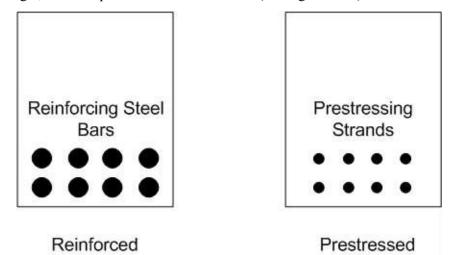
Non-prestressed Mild Steel Reinforced Concrete vs. Precast Prestressed Concrete
